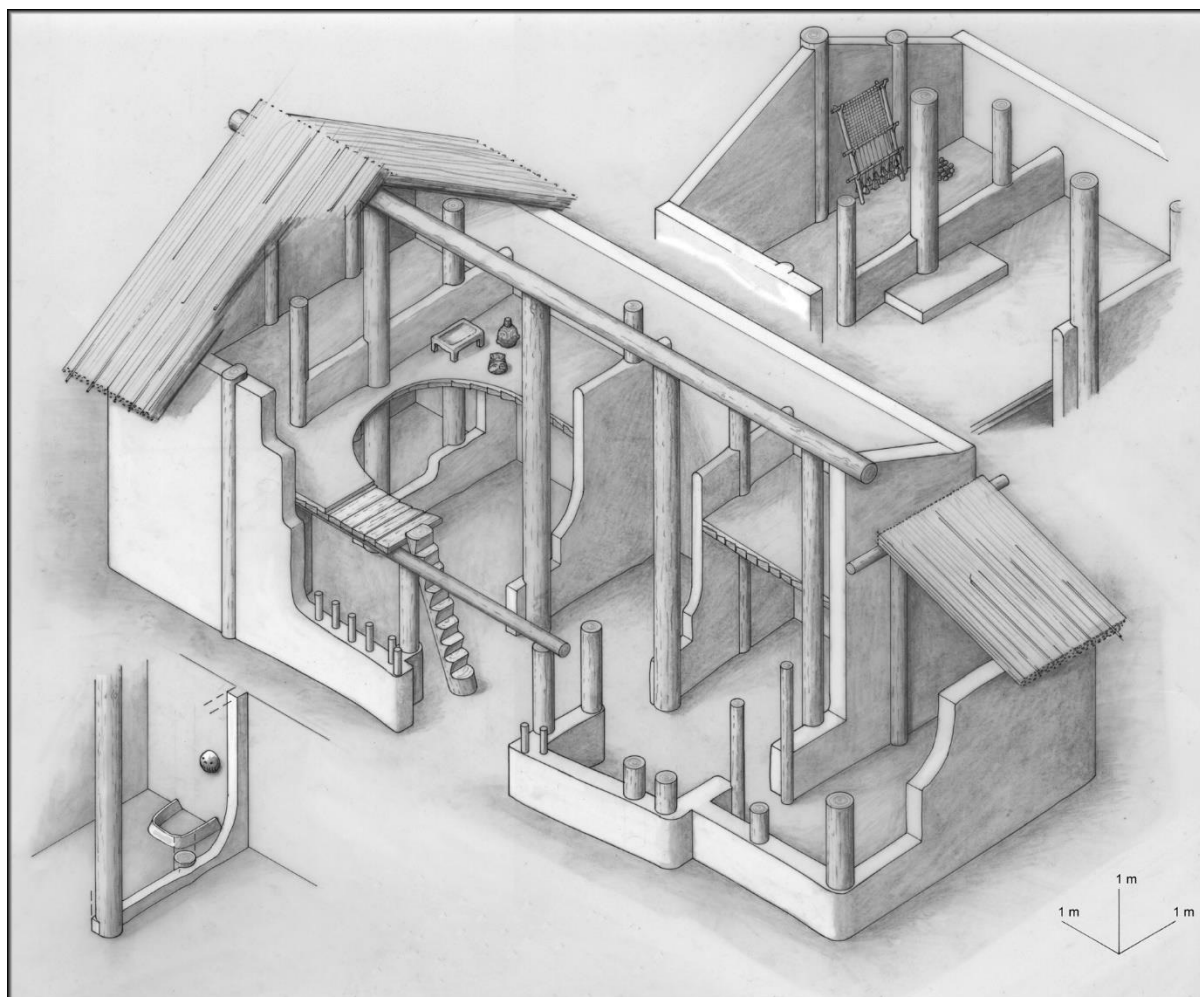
Graphic reconstruction of House H4b-1 from Uivar – Gomilă (after Schier 2014: Abb. 12).
